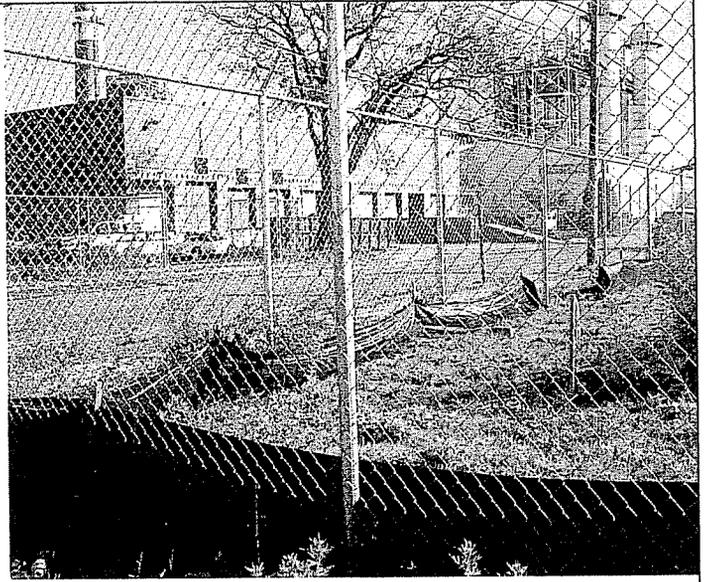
Singer Substation, view of silt fence in need of repair, northwest corner of site
